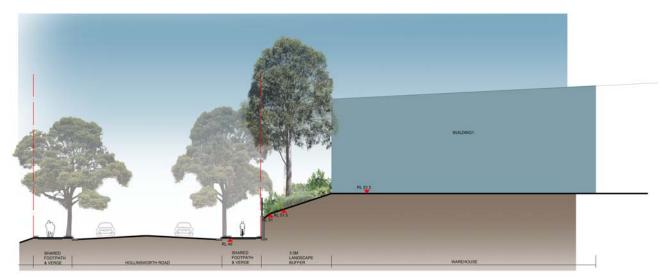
SECTION THROUGH THE HOLLINSWORTH ROAD BUFFER (BUILDING 1)
